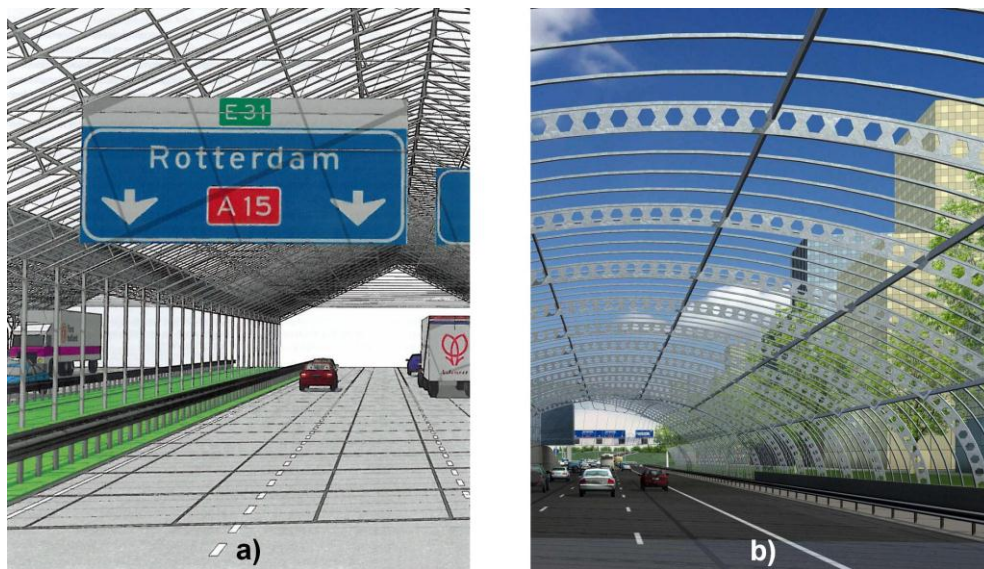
Glass-and-steel encasing of highways, conceptual designs
